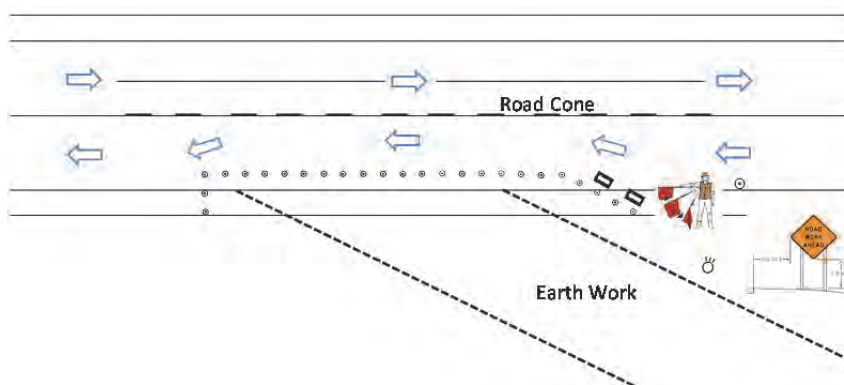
Traffic Diversion Plan during Construction (Section-B and Jhikorgacha)
